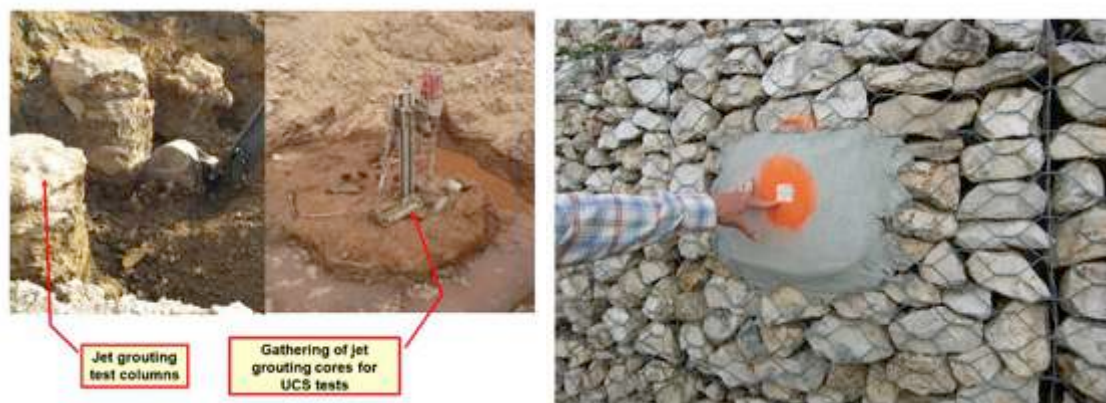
Jet grouting columns quality control and gabions wall instrumentation.
